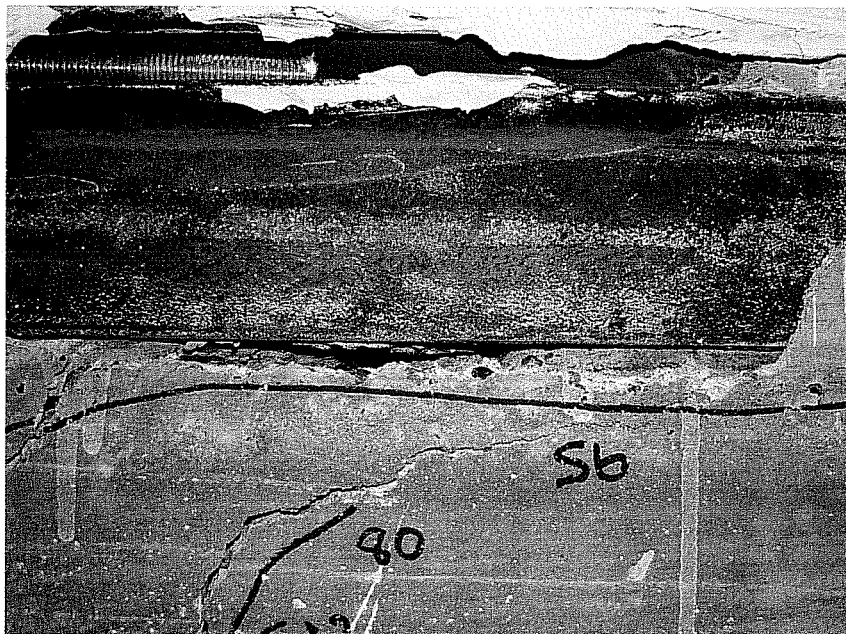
Failure of Overhang Test Area 3, top view, facing north
